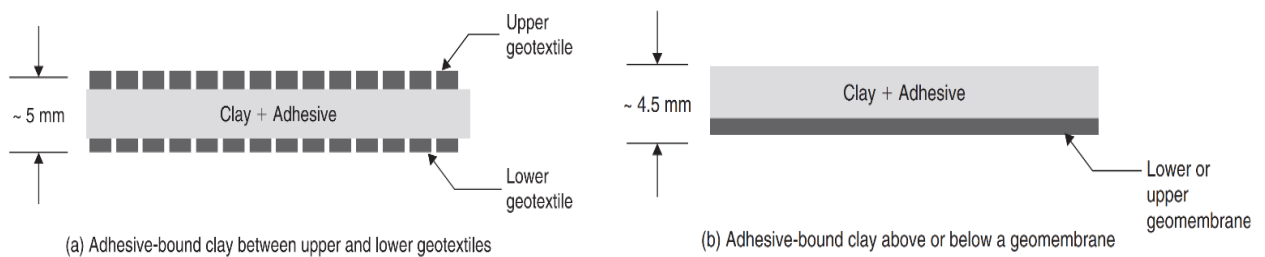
Cross sections of typical unreinforced GCLs. (after Bouazza & Bowders, 2009)
